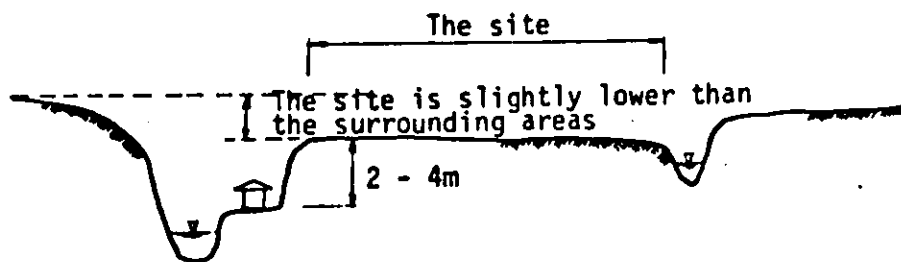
Relation of the Elevation between Surrounding Area and the Site
